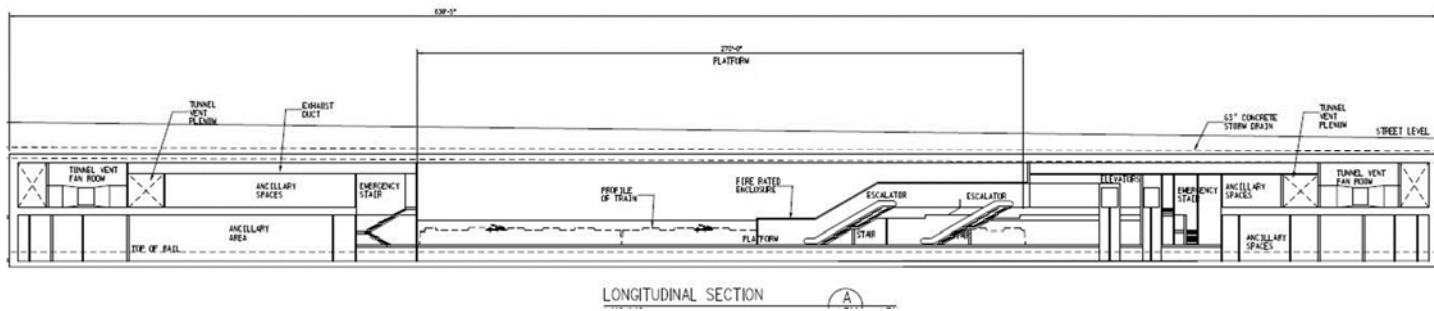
Typical Underground Station with Vent Plant on Both Ends
